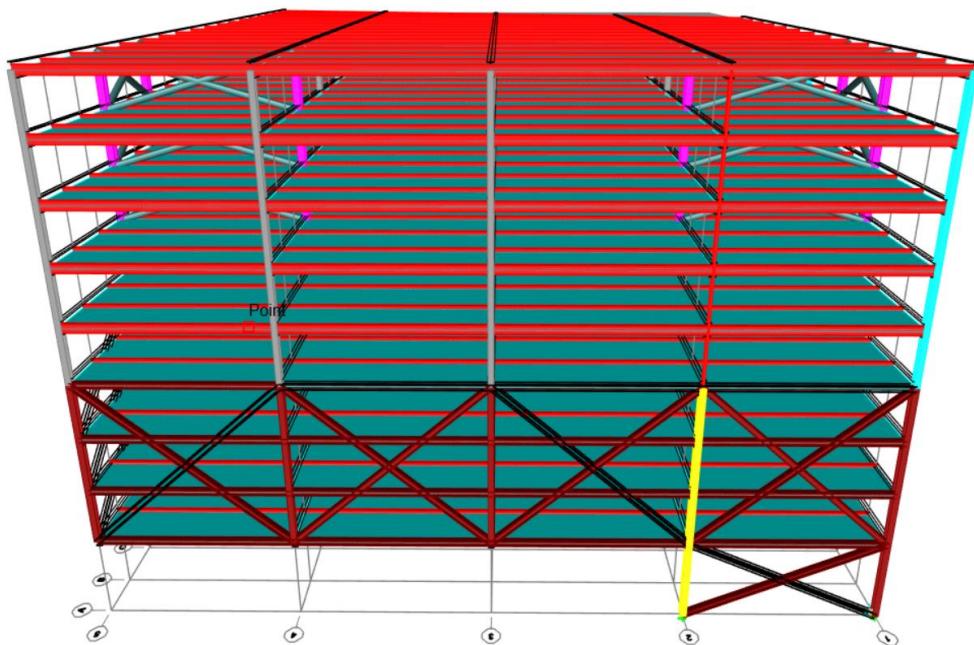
Global Structural Model for Proposal 1 (SAP2000)
